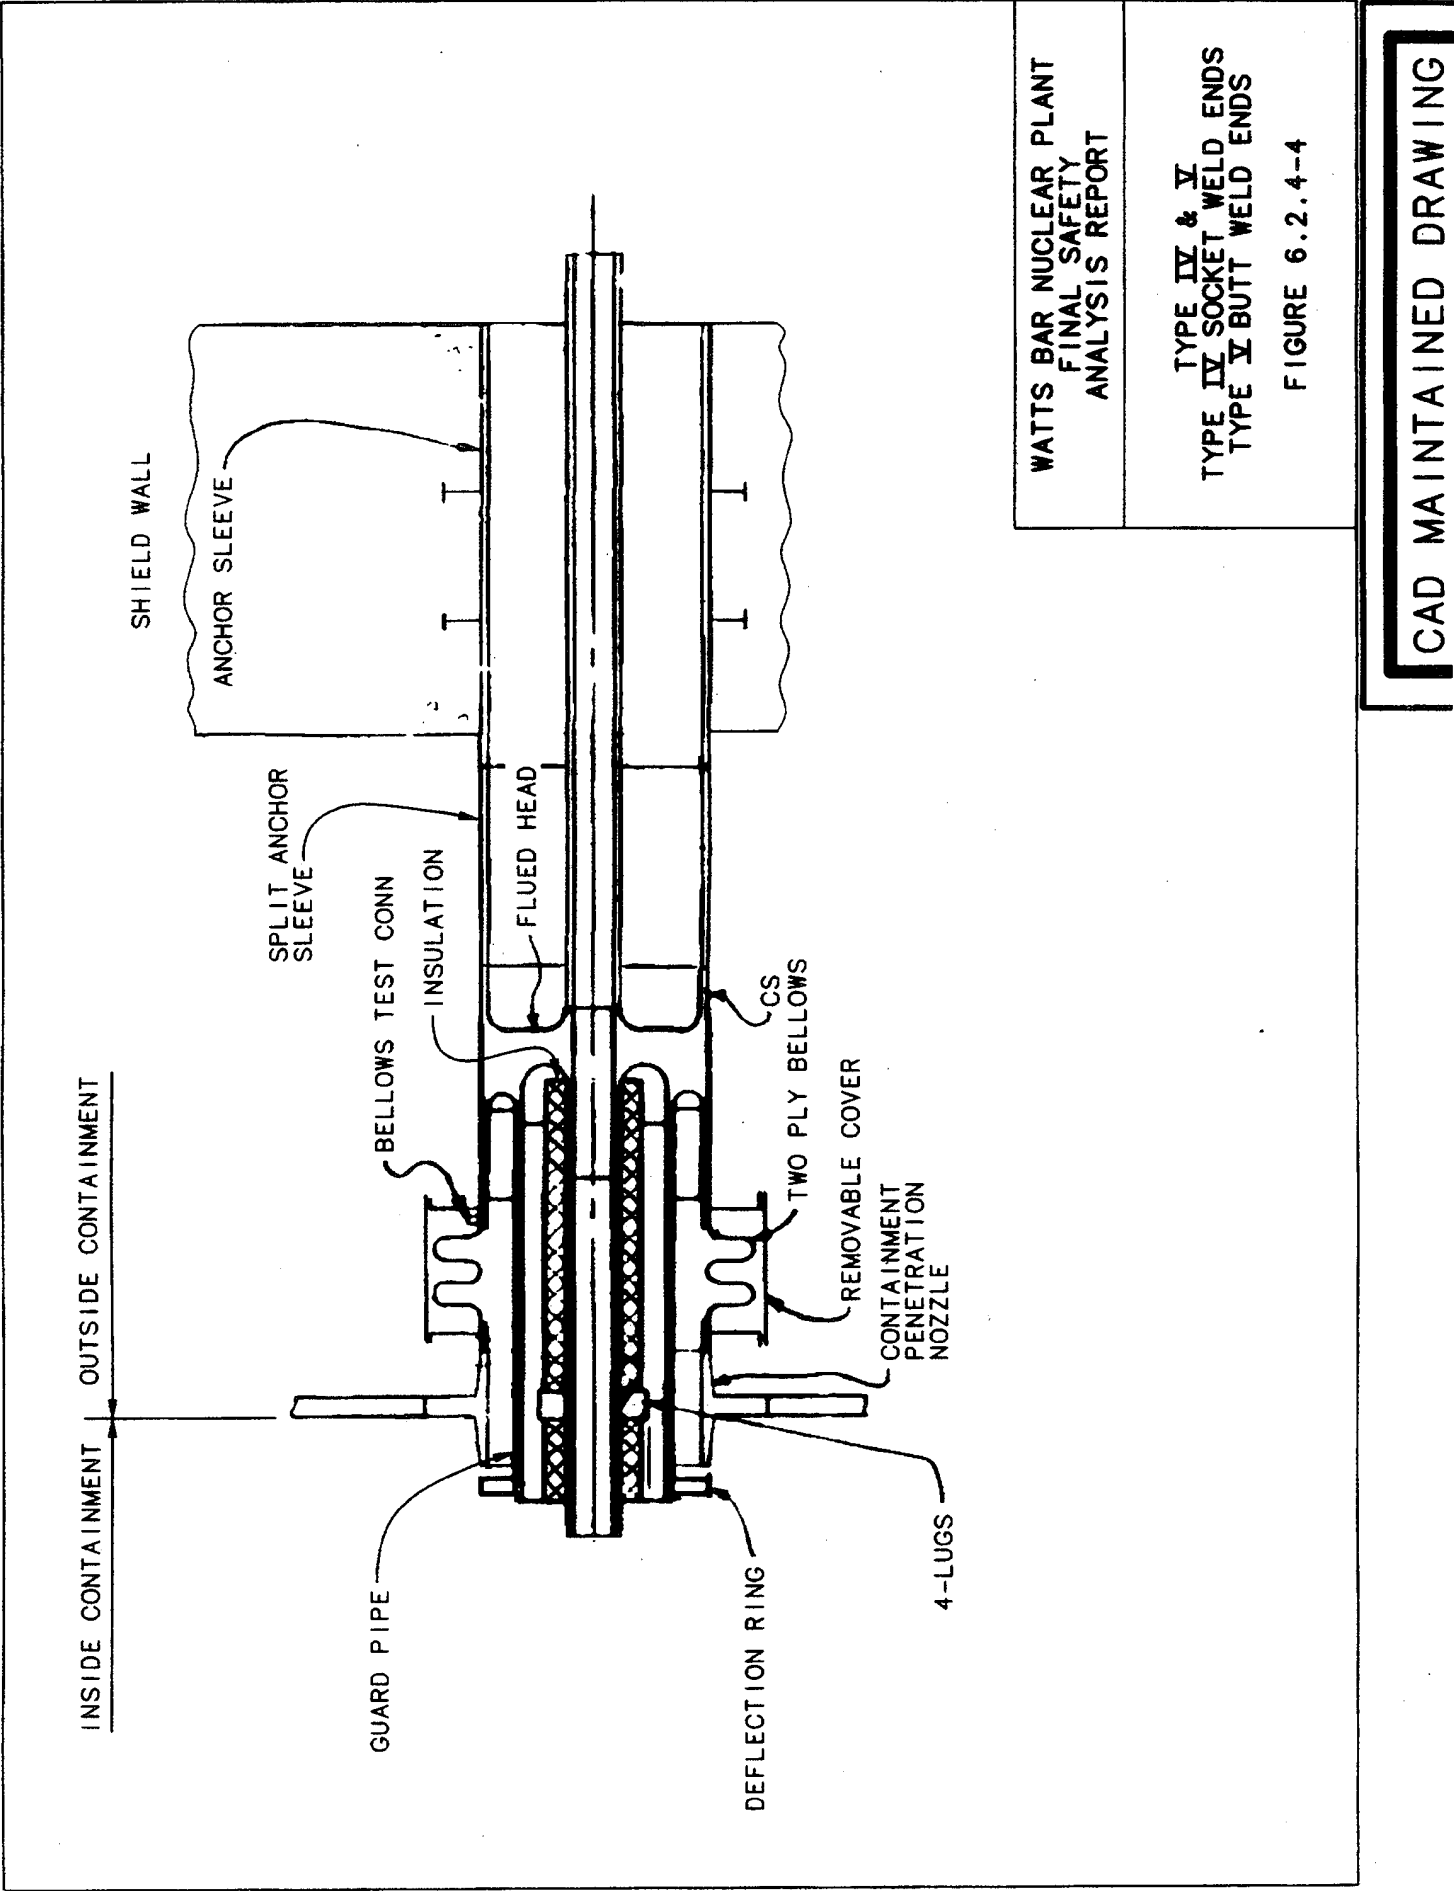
Type IV and V (Type IV Socket Weld Ends, Type V Butt Weld Ends)
